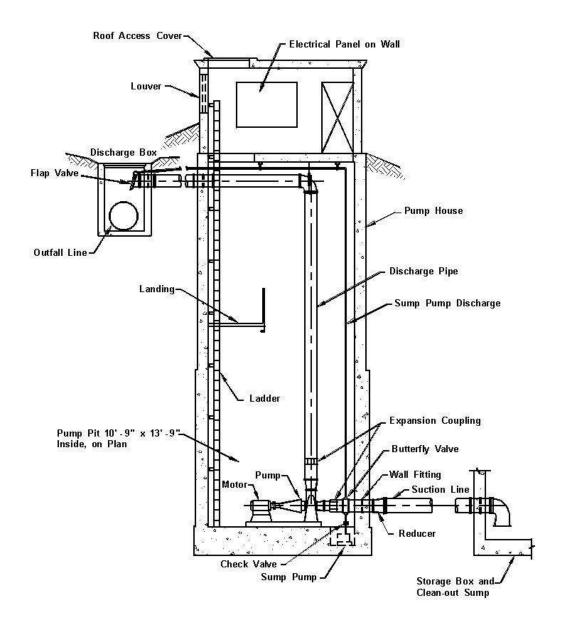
Dry Pit Pump Station with horizontal centrifugal pump
